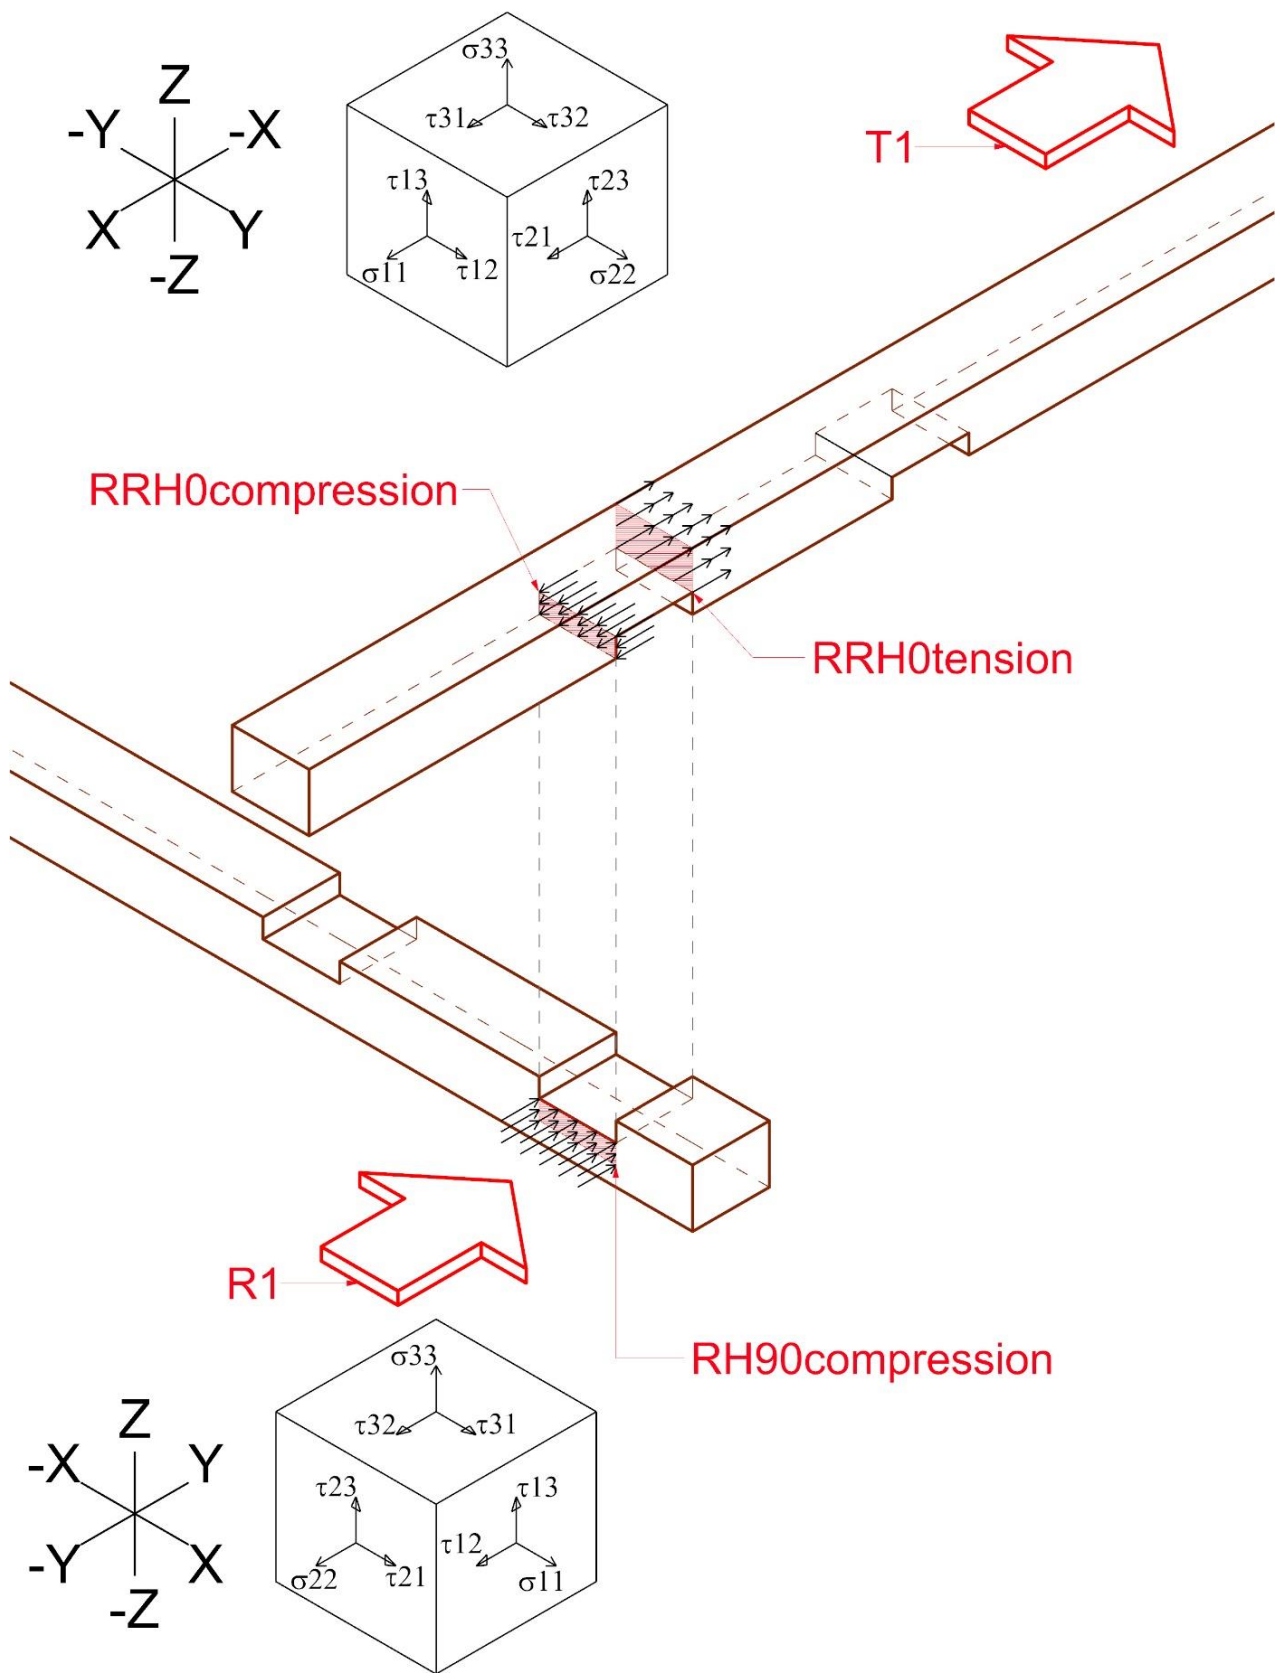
Roof Rafter Head Axial stresses : Crossing rafters T1-R1
